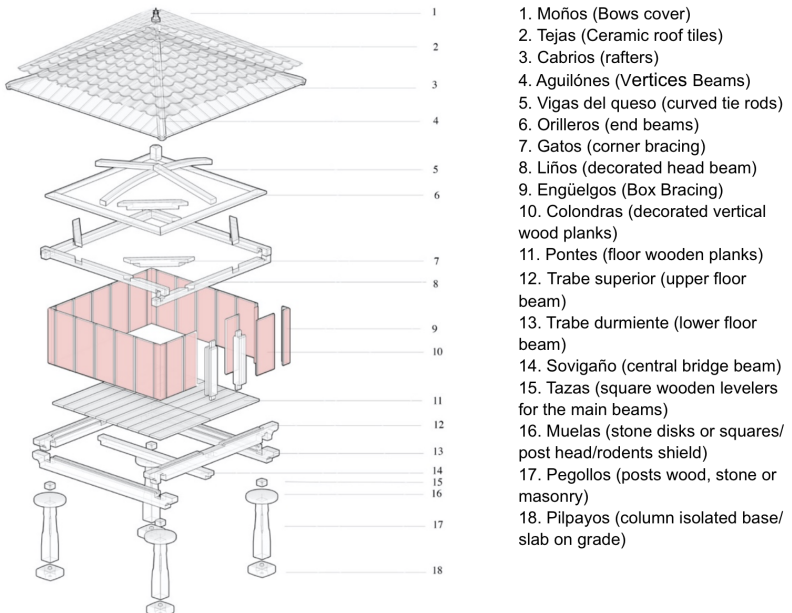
Exploded drawing of the elements of a typical Spanish Hórreos. Source: (Author 2014)
